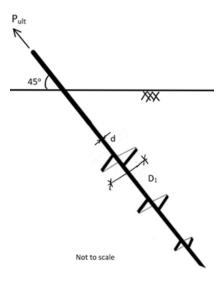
Tri-helical ground anchor installed at 45 degree angle
